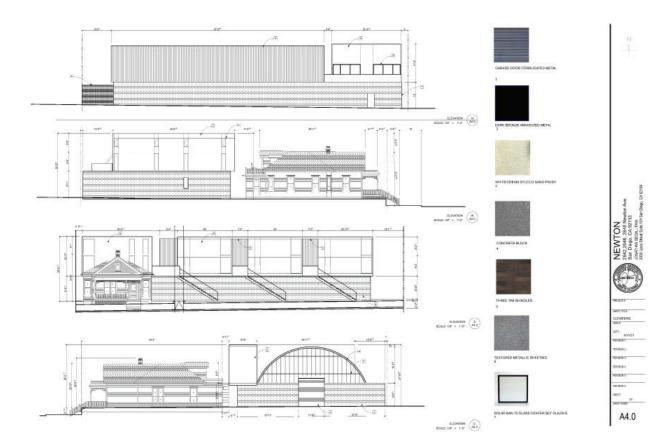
Proposed building elevations at the Newton Avenue site. Source: Matthew Segal.
